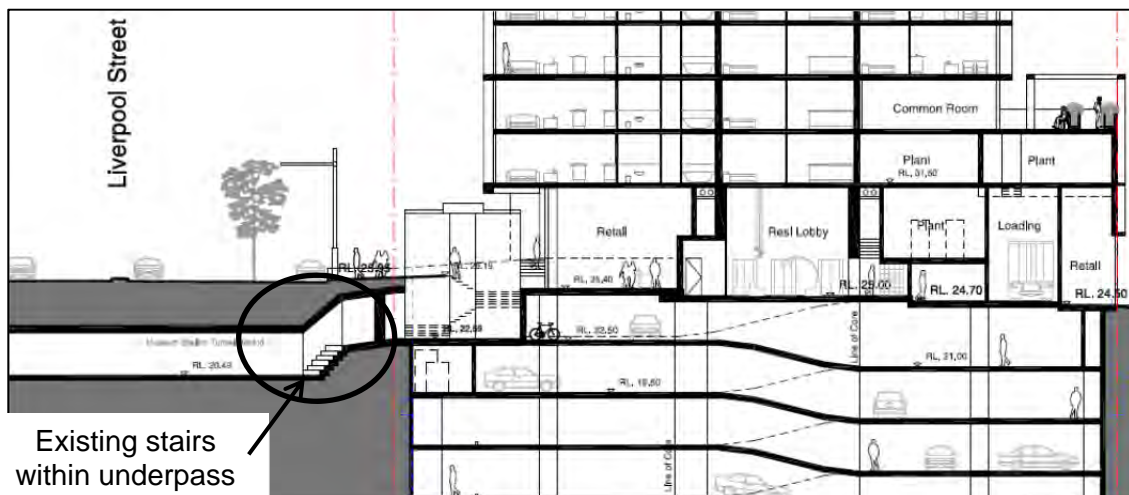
A sectional drawing illustrating the proposed relocated station entry and the impediments of the existing stairs and level changes within the underpass tunnel
